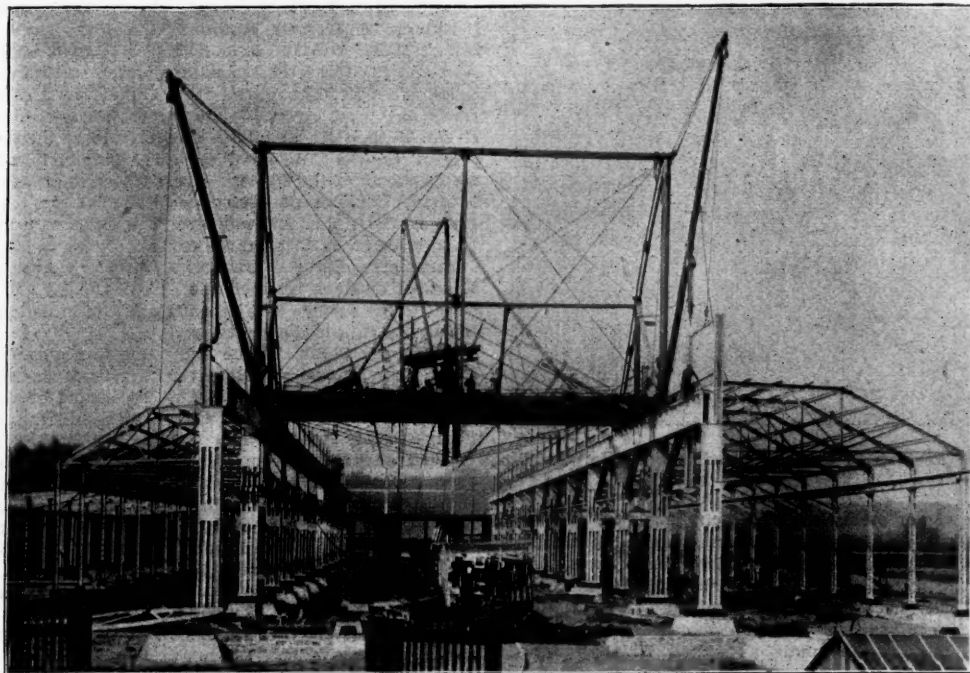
Frame-Work of New Iron Foundry at Schenectady.
